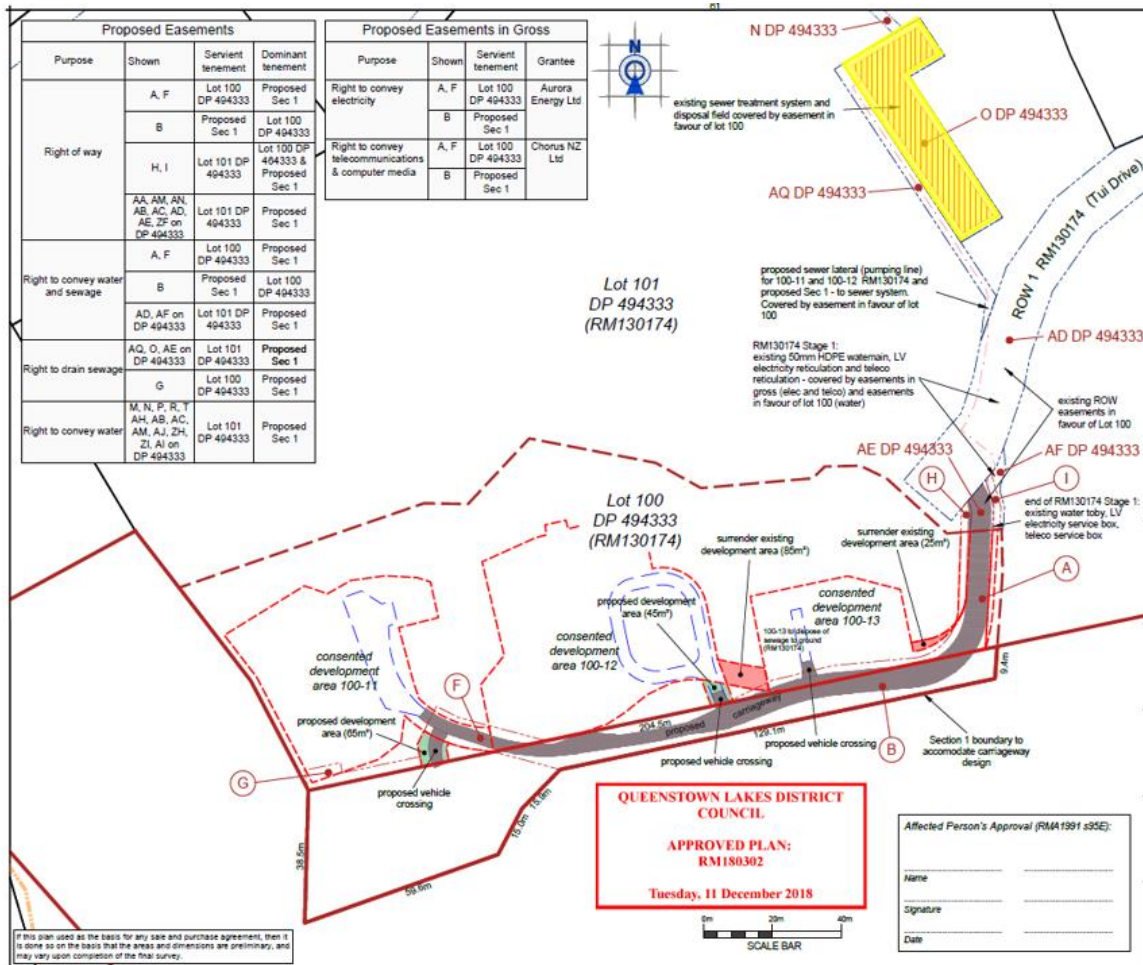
Existing Wastewater Treatment Plant and Disposal Field location highlighted in yellow on Lot 100 DP494333. Image Source: RM180302
